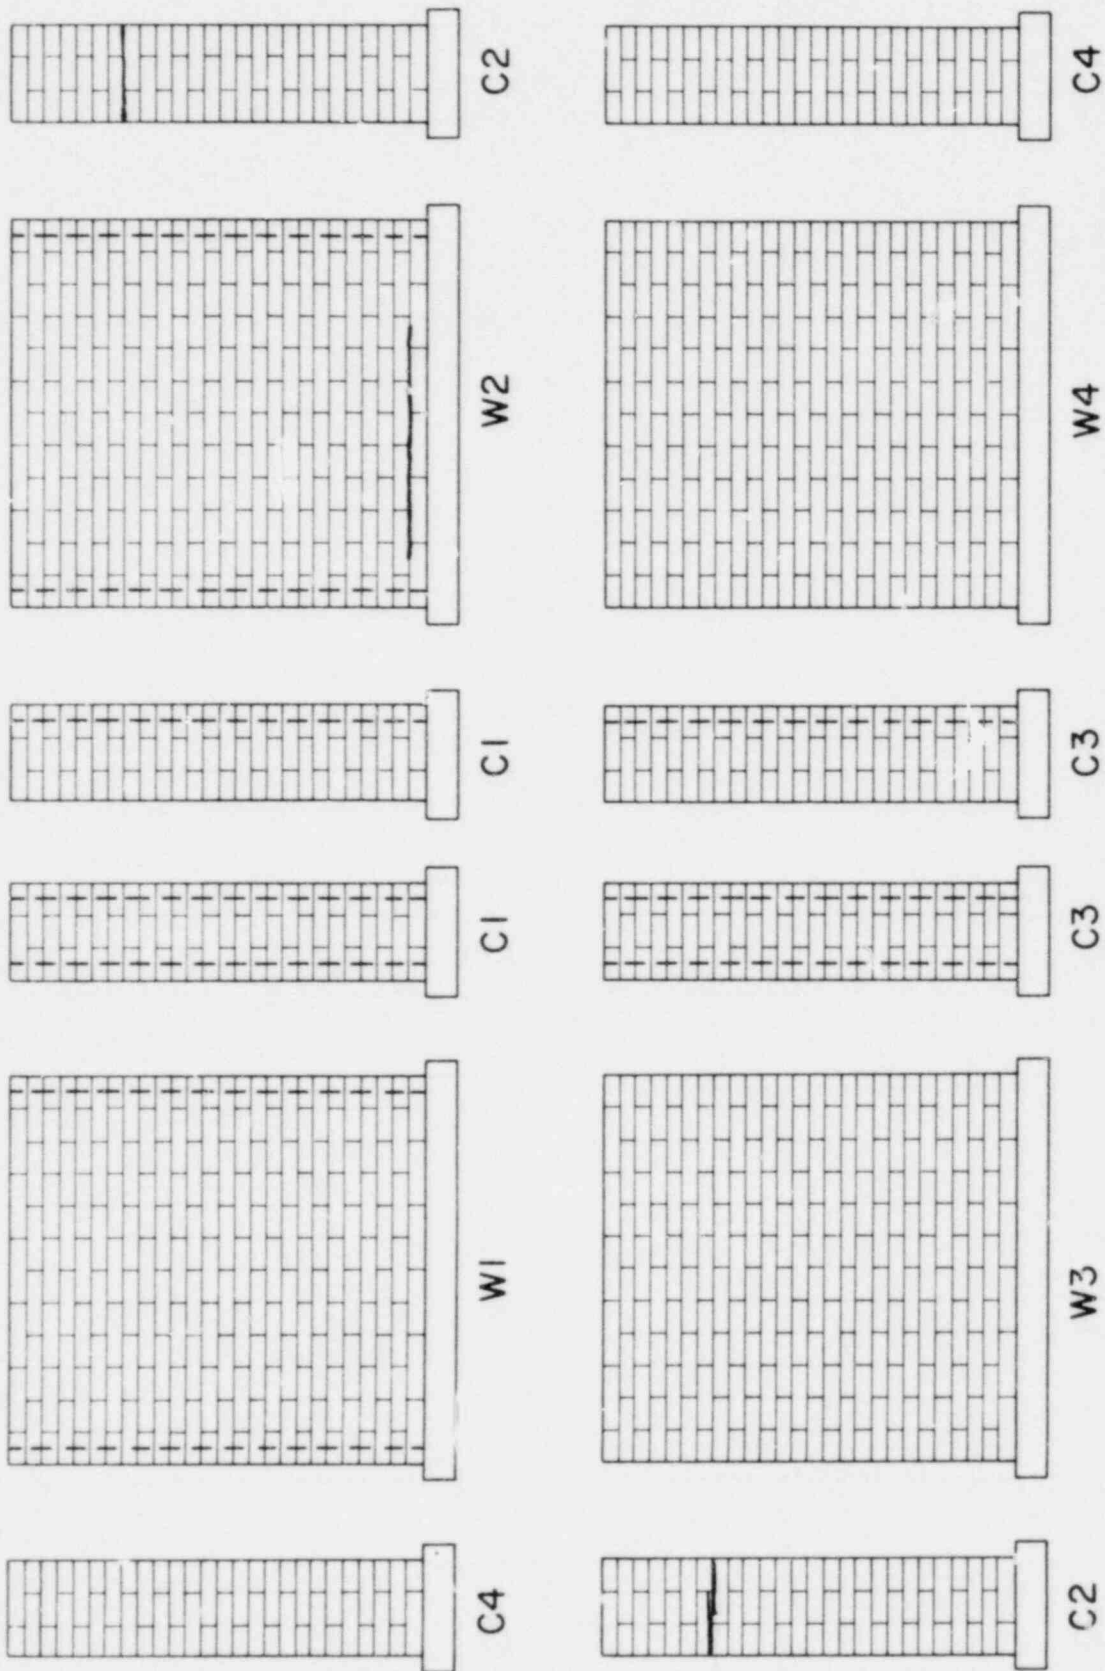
(g) DISTRIBUTION OF CRACKS IN THE MASONRY COMPONENTS: HOUSE 1, AFTER TEST 24
